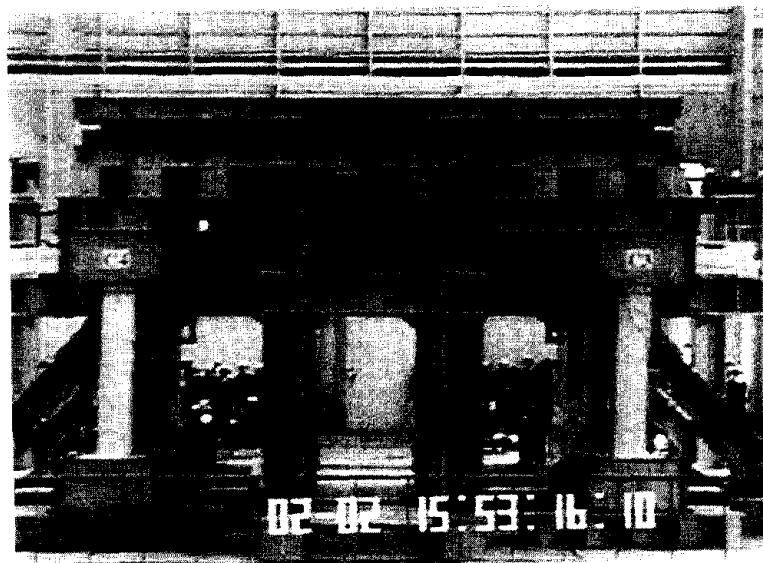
Crack at the Bottom of C4 Column (A-Type, North Side)
